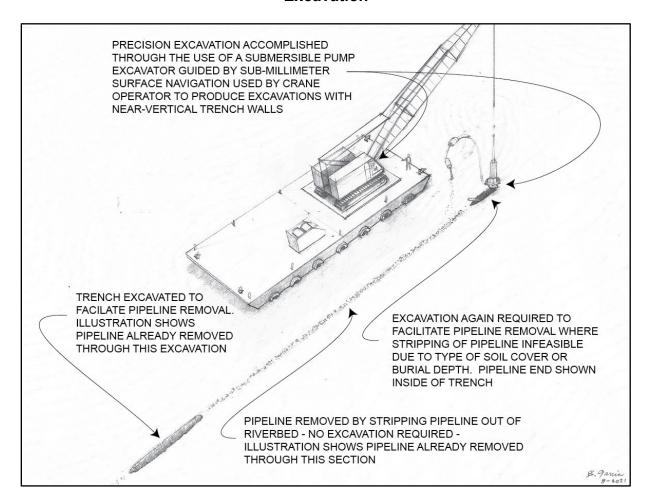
Artist's Conception of Toyo Pump Being Used to Perform Underwater Excavation
